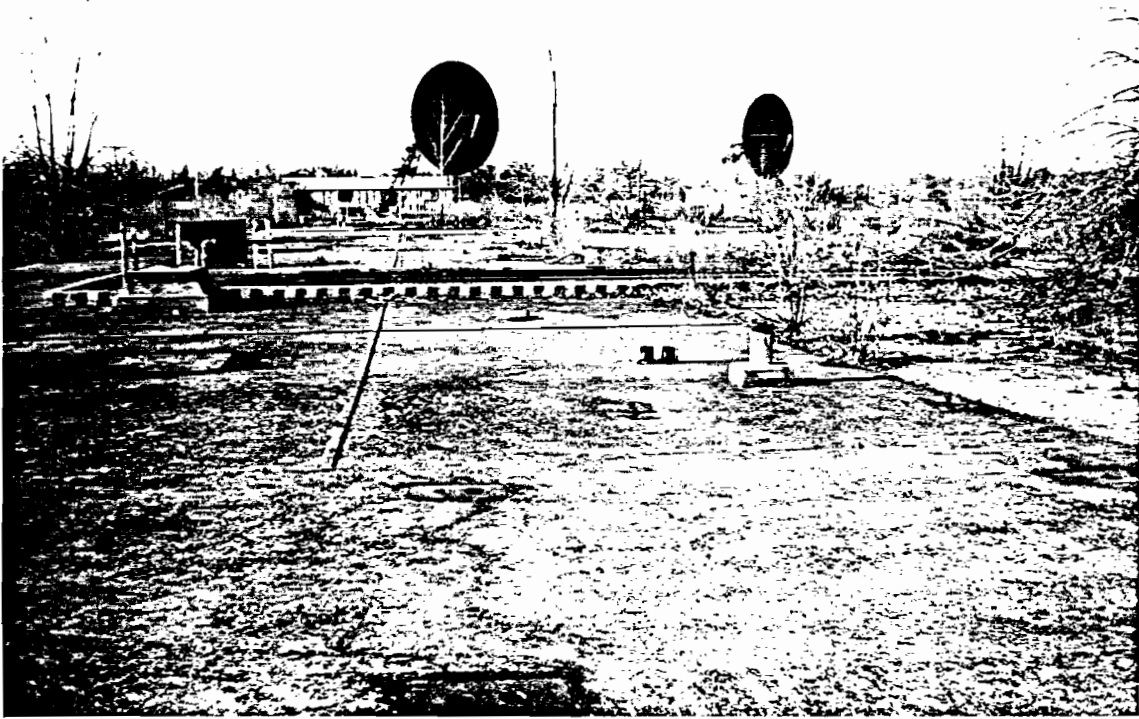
Lockport Annex; note antennas, office building, power pad, and garage at north end of facility; facing east.
